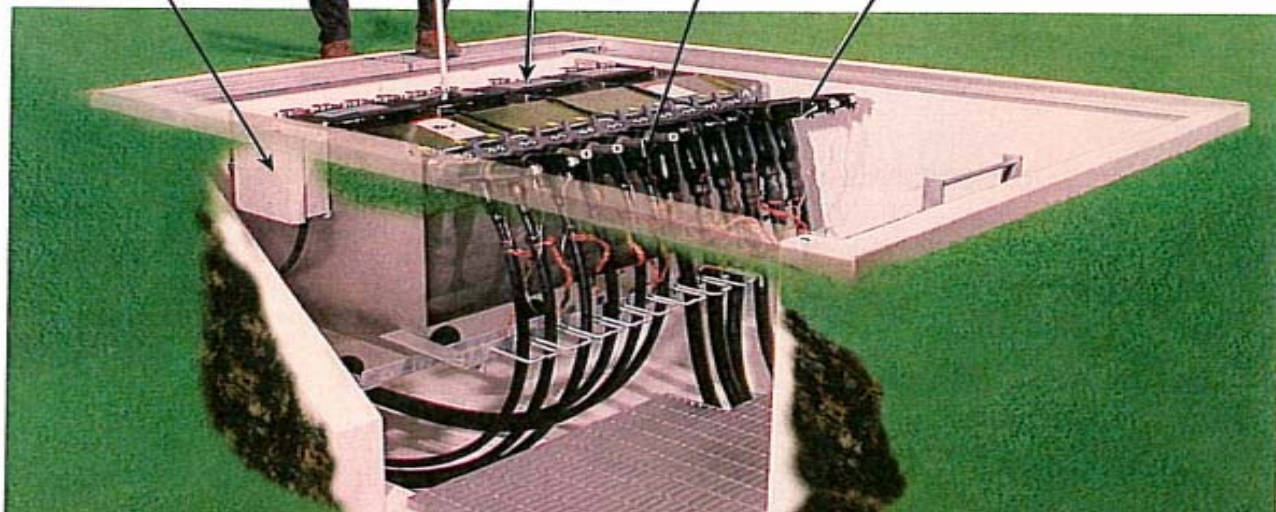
Typical Cross Section View of S&C Low Profile Pad Mounted 15kV Distribution Switchgear.
